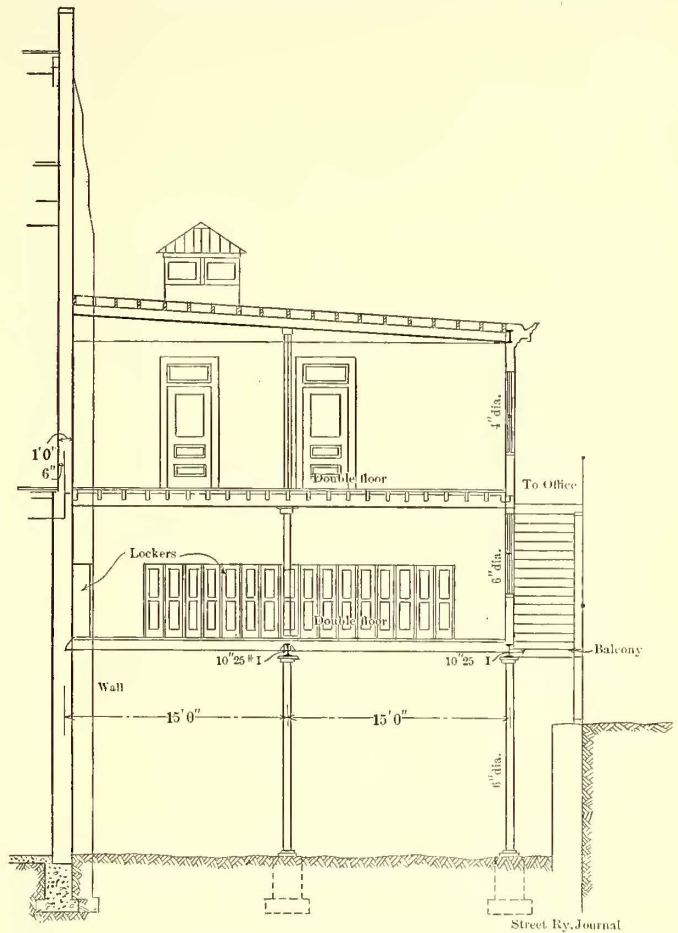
TRANSVERSE SECTION OF THE OFFICE BUILDING PROJECTING FROM THE MAIN SHOP STRUCTURE
